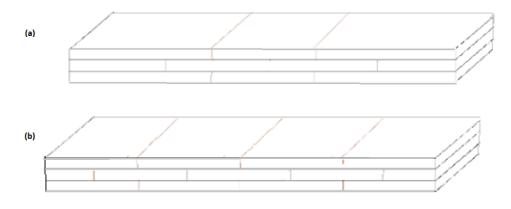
ICB core bonding layout for the IMIP sandwich panels (B panels). (a) subtype B1; (b) sutype B2.
